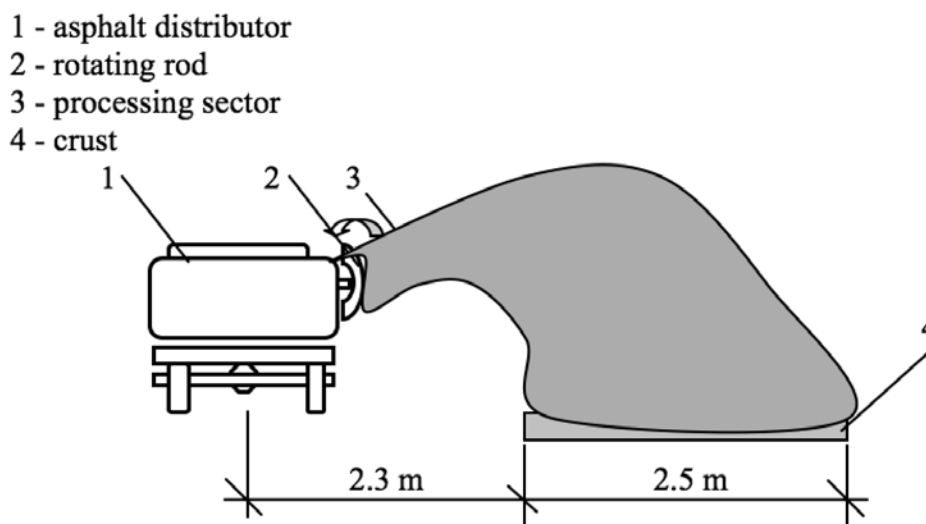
The use of pavers for fixing sandy slopes and roadside road
